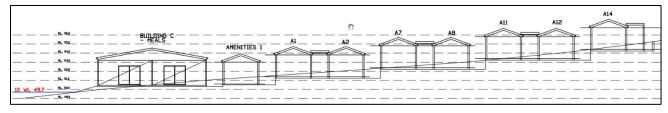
Cross-section through development showing buildings and 1% AEP flood level
